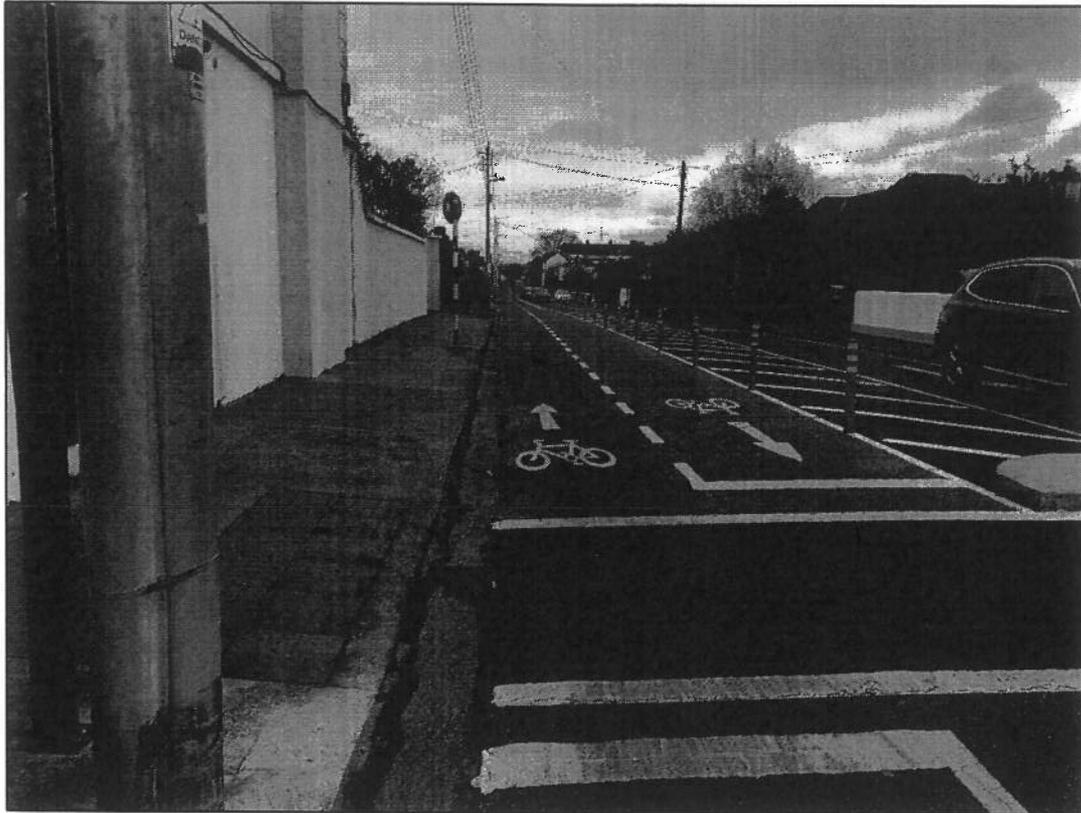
Buildings and Artificial Surfaces (BL3) (Road, Pathways, Cycle Lane, Concrete wall, Residential dwellings) at Seapoint Avenue (Section A) to the south of the works area.
